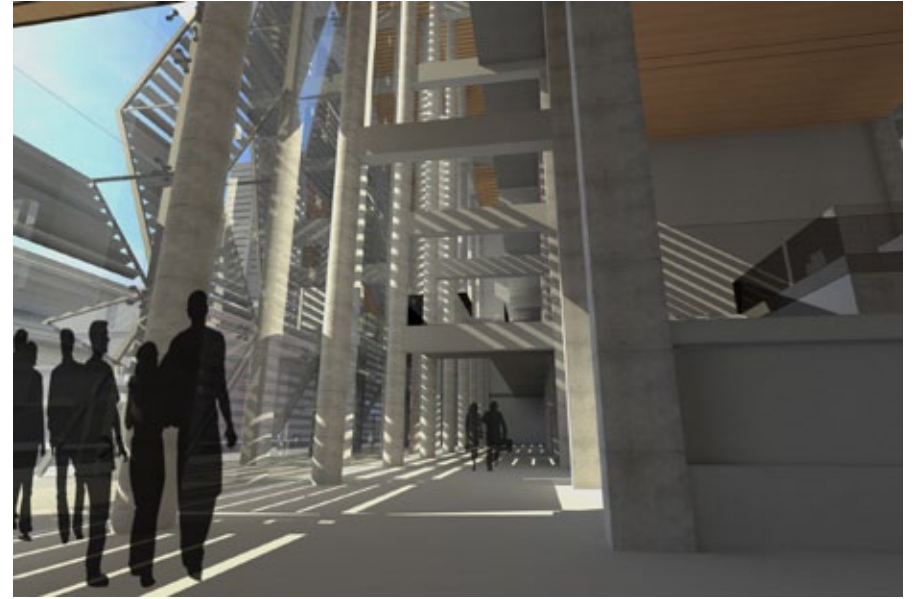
Perspective showing retail arcade and glass curtain wall shaded by external louvres
